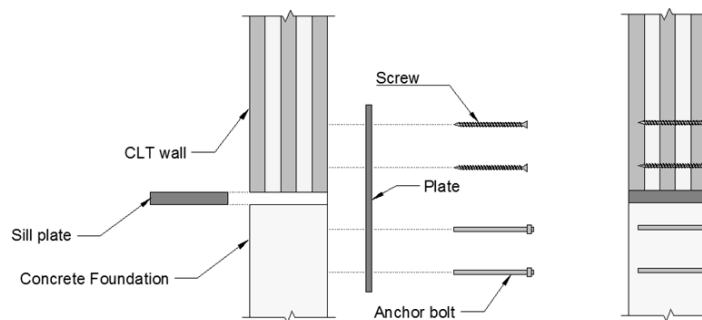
Straight plate connection between foundation and CLT wall.
